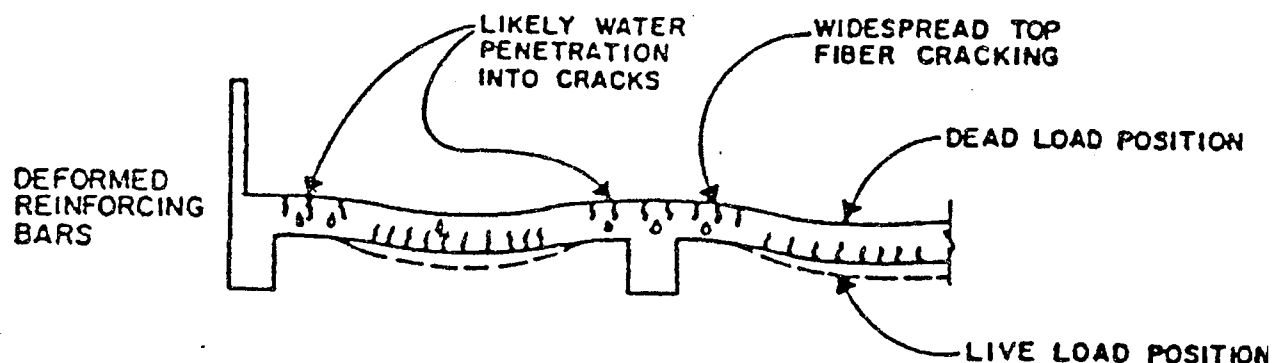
Schematic Continuous span slab construction under gravity loads
